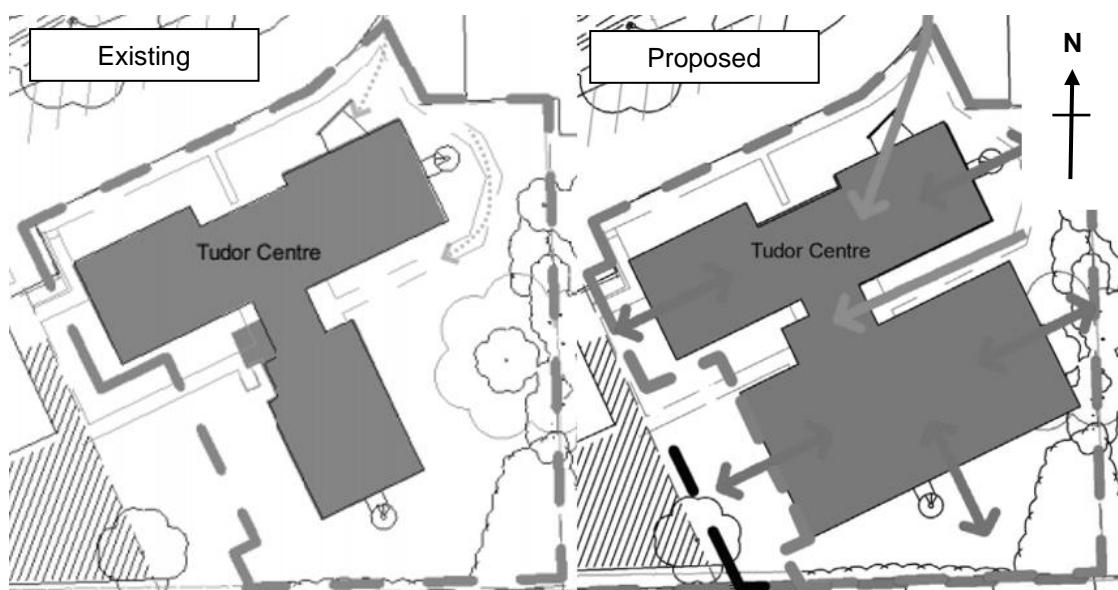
EXTRACT: Tudor Centre plan – existing vs proposed
